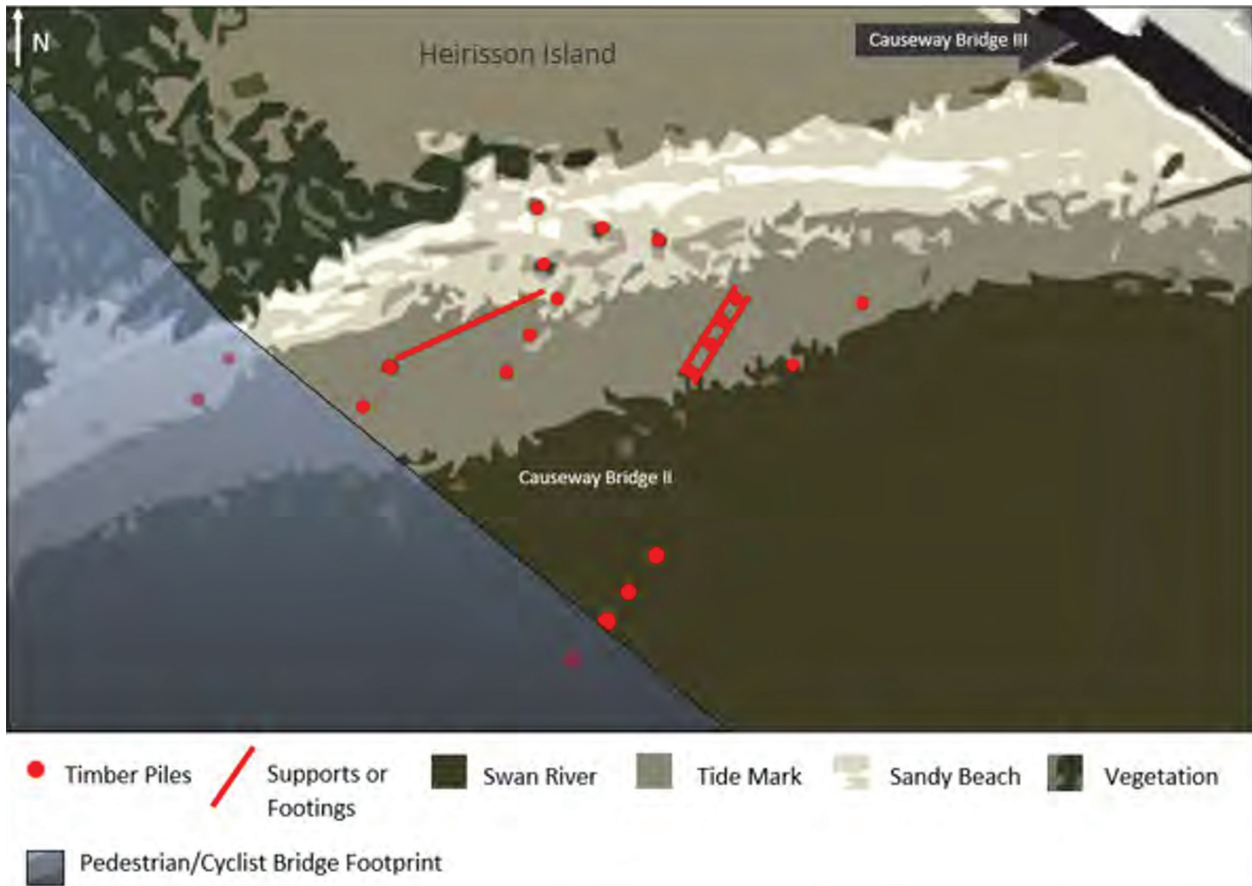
Site plan of remnant timber piles, support beams and footings associated with Causeway Bridge II, immediately west of the existing Causeway Bridge III (Source: Archae-aus, 2021)
